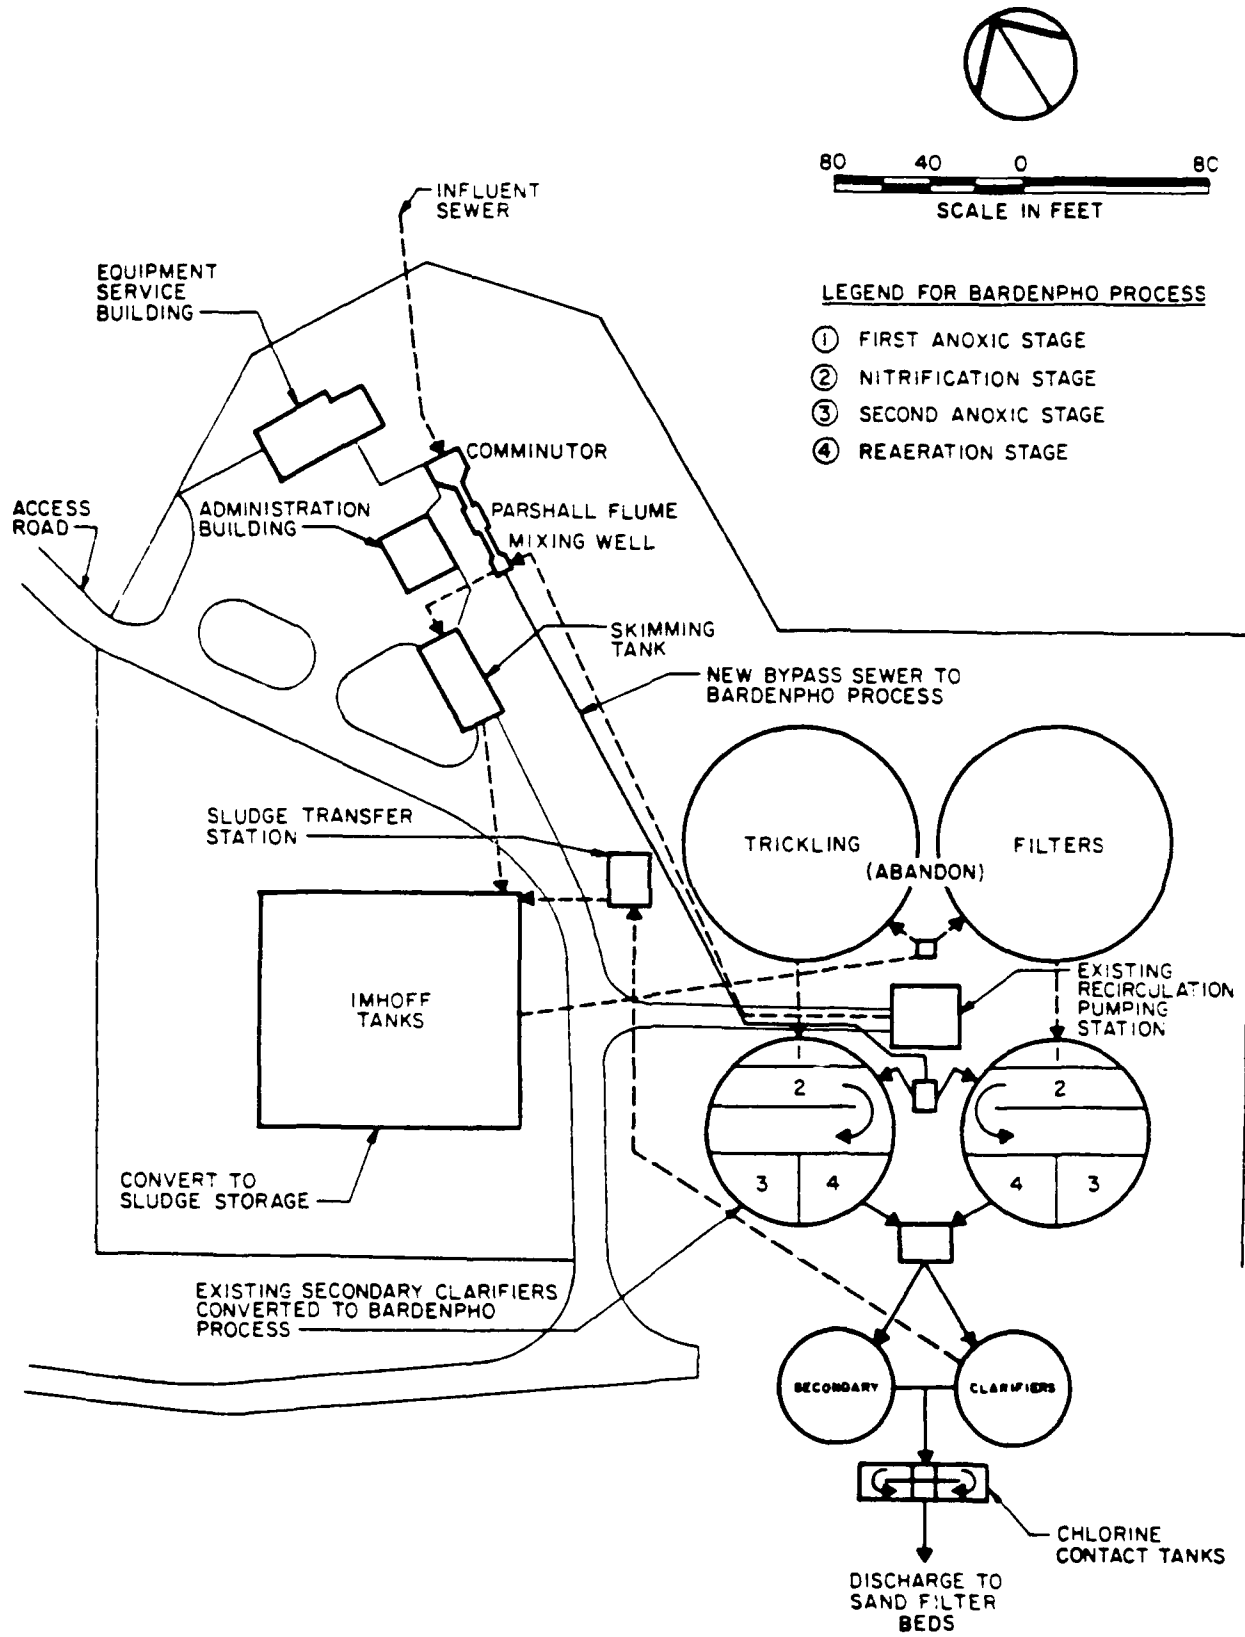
Site Plan for MMR Alternative 3 (Source: CDM 1985)
